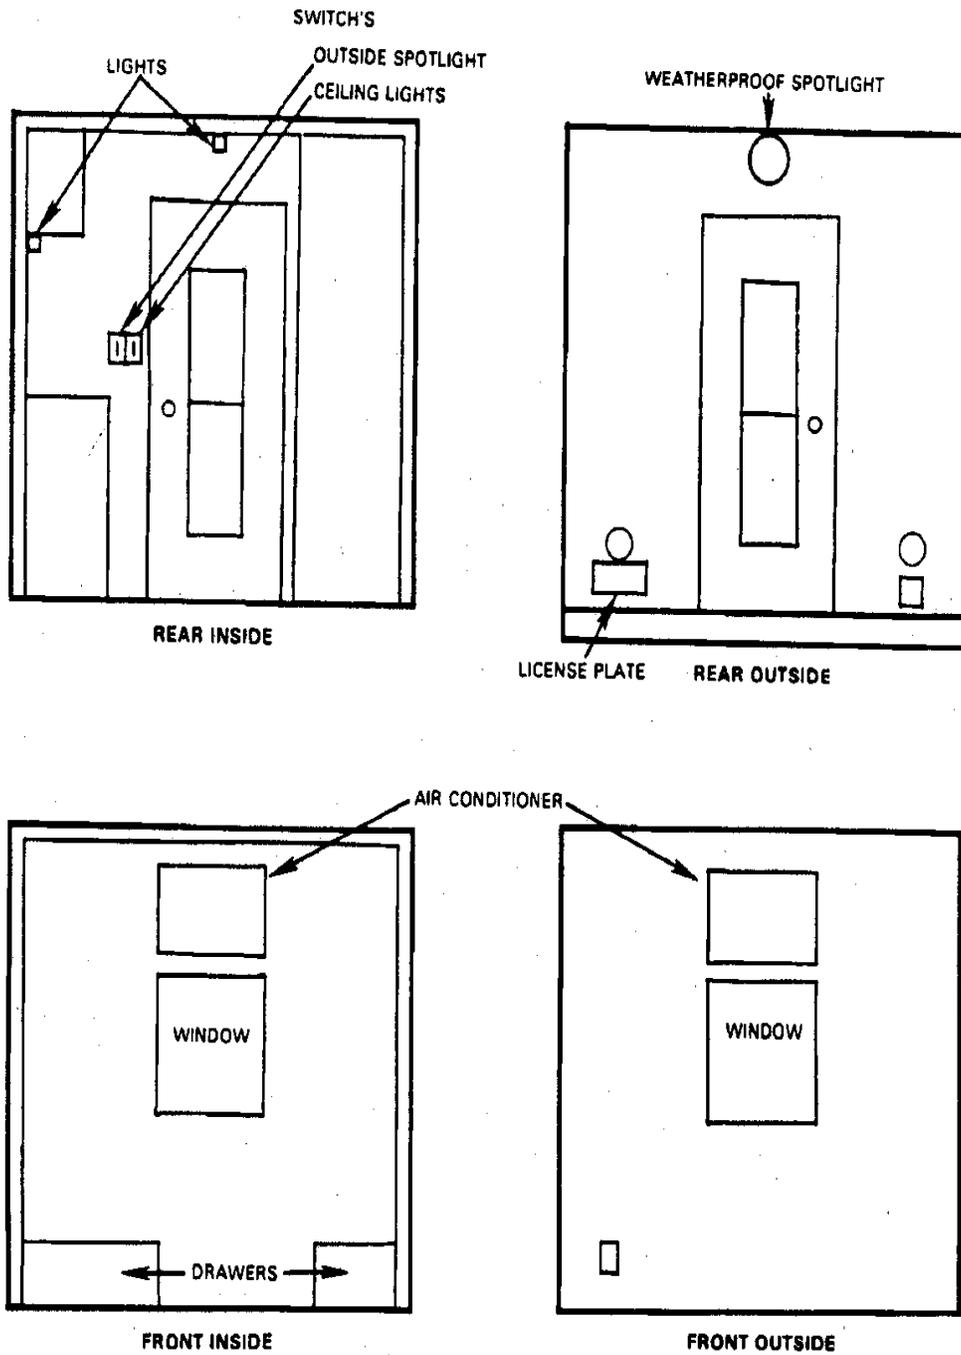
Mobile bioassay laboratory, tandem-axle trailer, external and internal end views.
